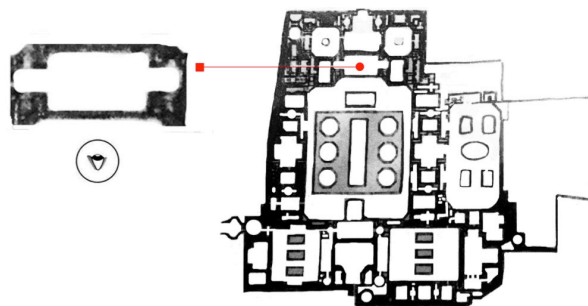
Carpet Design on the ceiling of porch (M.Adib, 2016)
